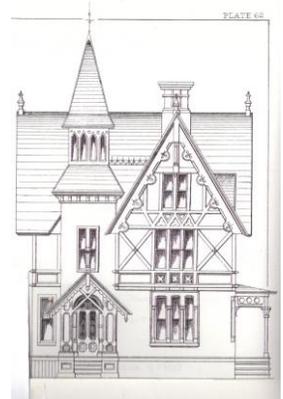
, front elevation, design by D. T. Atwood, in A. J. Bicknell, *Detail, Cottage and Constructive Architecture*, New York: A.J. Bicknell & Co., 1873.
